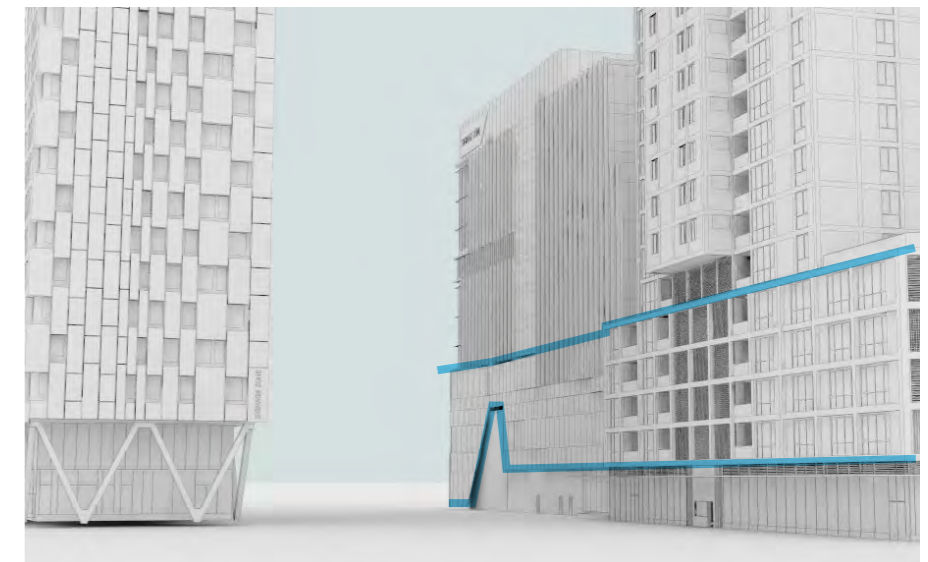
NW Plot maintaining Darling Drive street wall alignment with SW Plot's podium. View from south west.
